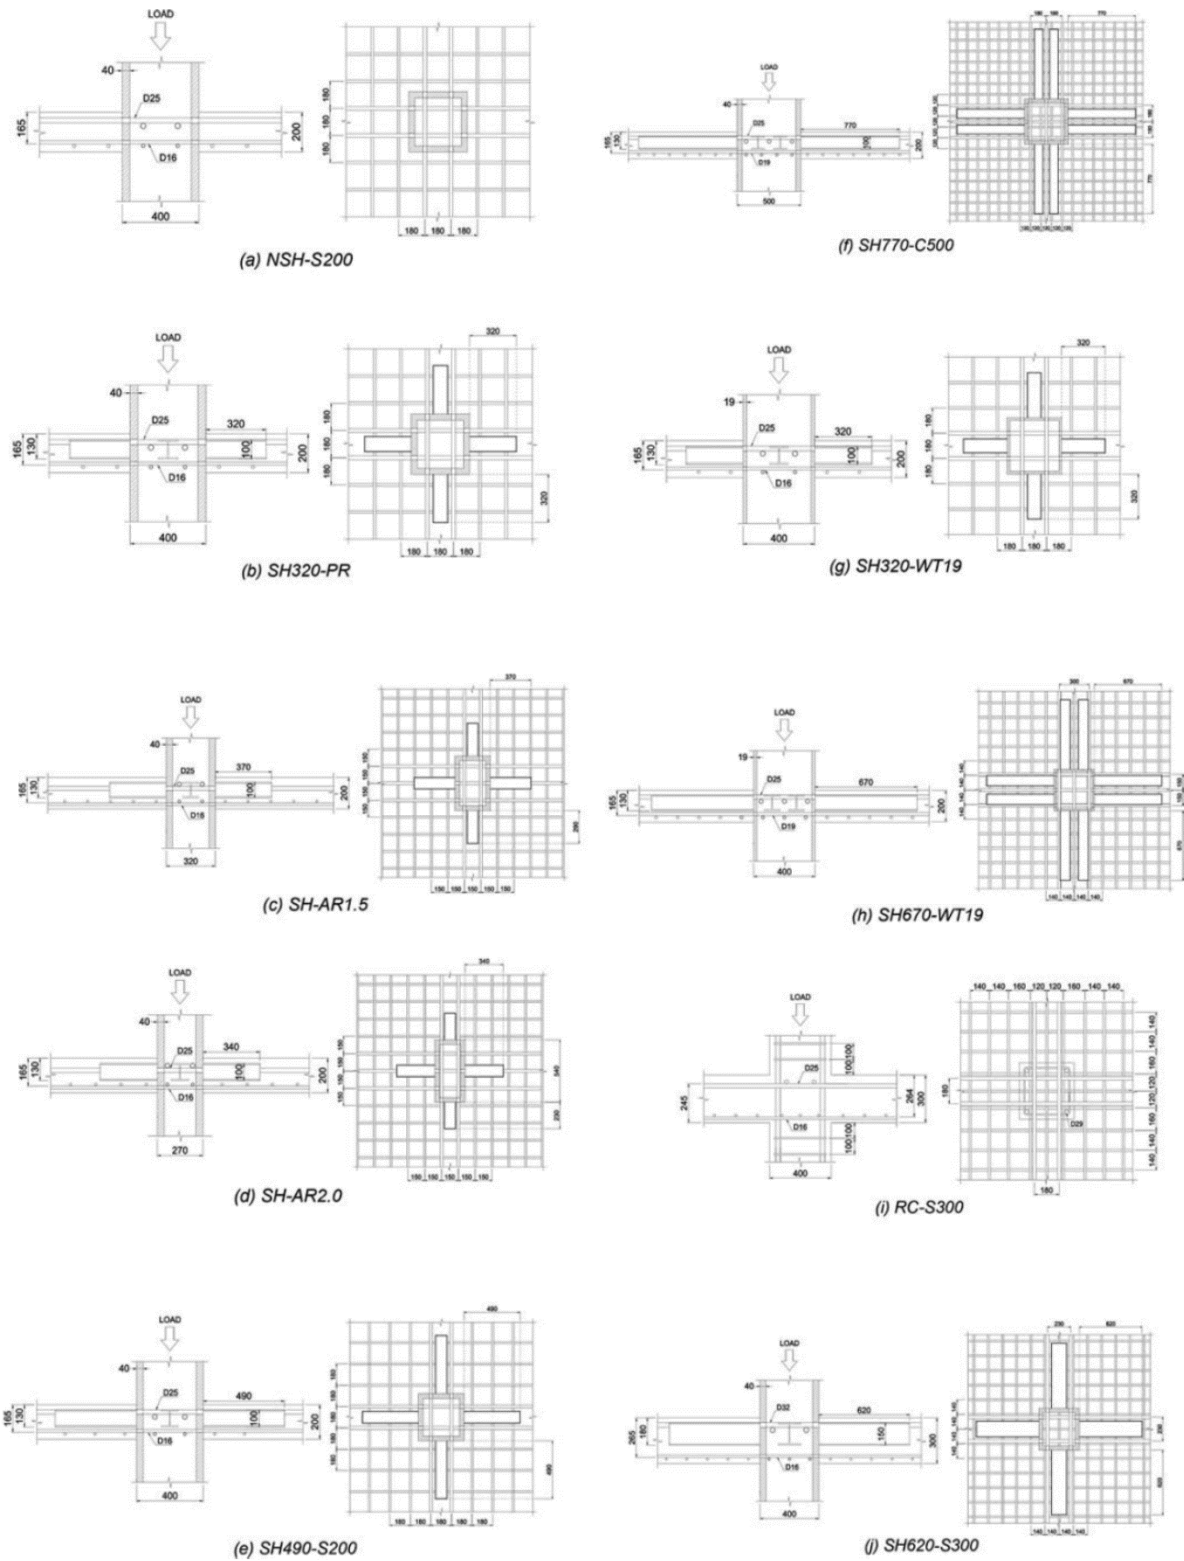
Section Geometry and its Connection Details, Jin-Won Kim et. al. [2014]
